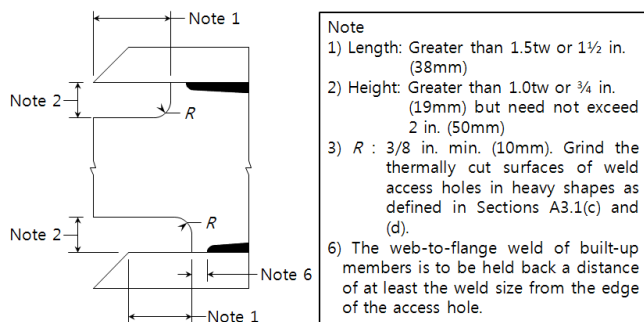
Recommended weld access hole geometry of built-up members per the 2010 AISC specifications: assembled after cutting⁽¹⁾
